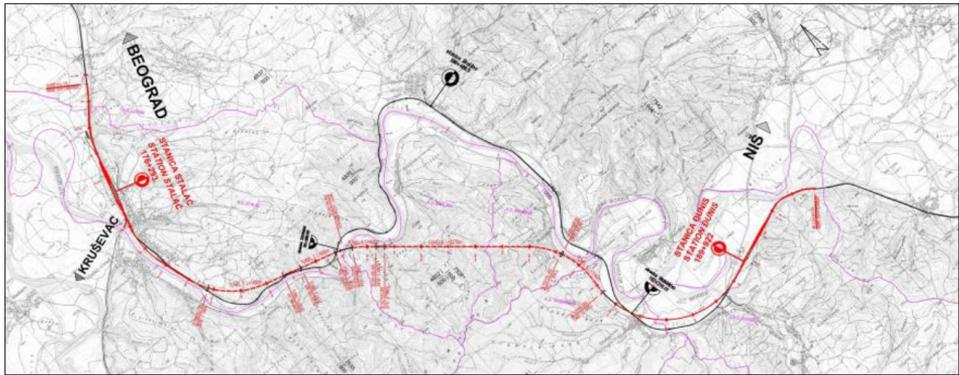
Overview map – existing and new alignment on the section Stalać-Đunis
